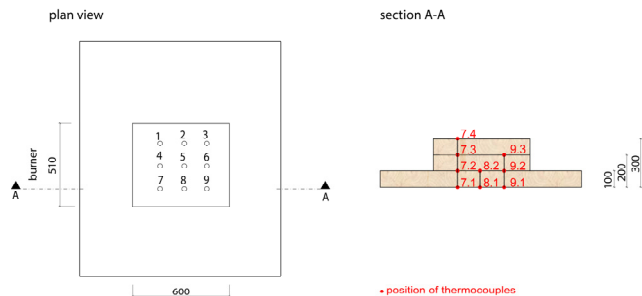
position of full thread screws in the CLT ceiling element with corresponding measuring points
